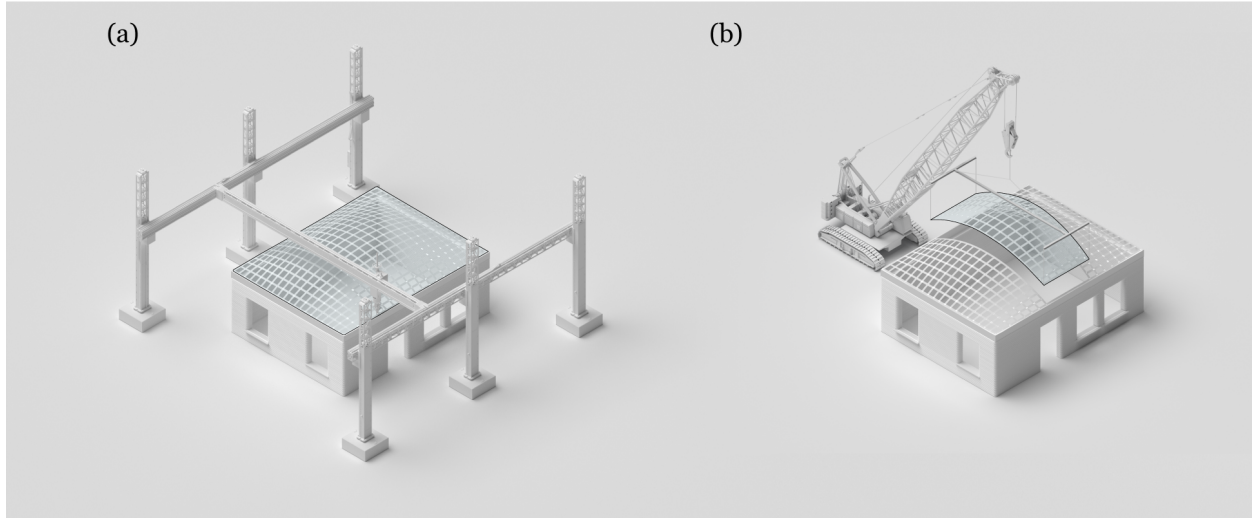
Vision for a new construction process of wide-spanning roof structures. (a) 3D printing onto a gridshell formwork structure directly on the construction site. (b) The gridshell formwork being prefabricated and printed on off-site and then lifted onto the 3D printed building walls by a crane.
